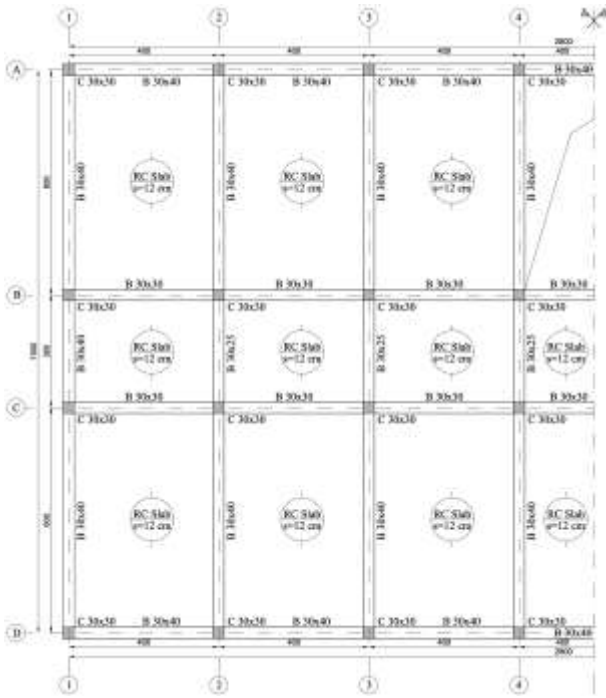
Typical horizontal cross section of the moment-resisting structure. Due to the symmetry of the structure only half of the planimetry is shown. Cross-sectional dimensions of beams (B) and columns (C) are indicated together with spans
